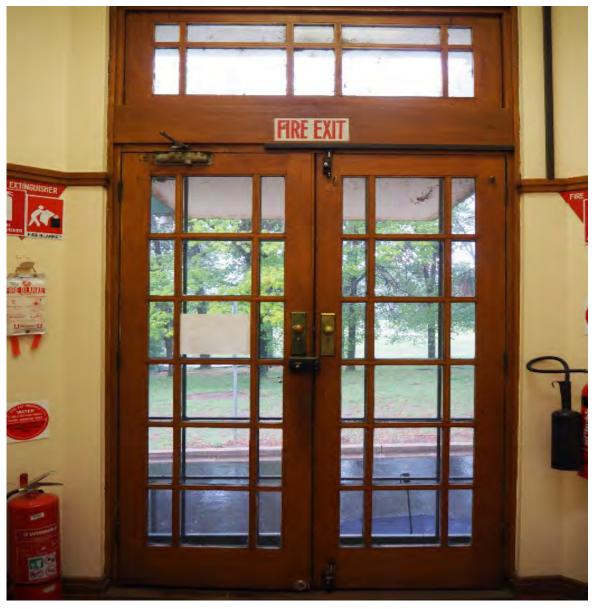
The former typists', secretary's room and a portion of the corridor has been converted into one large office, door with transom installed 1946
